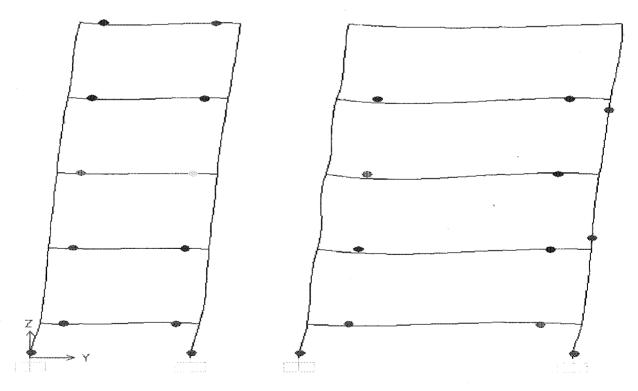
Yield Pattern at Ultimate Point for 4-Storey Building Designed as OMRF in Transverse Direction
